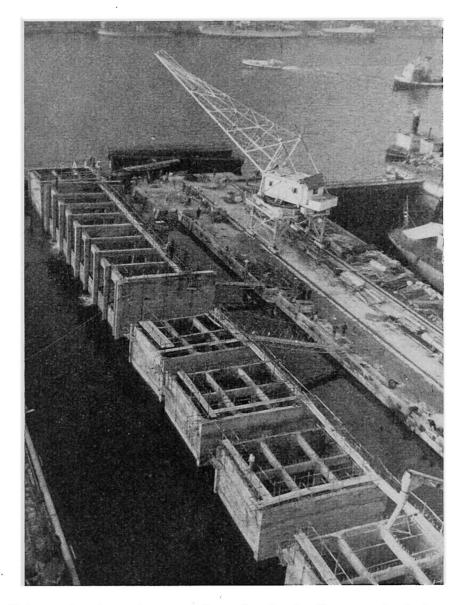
Edisonvolta thermal power plant, La Spezia. Precast wharf elements floating and ready to be trailed to destination.
